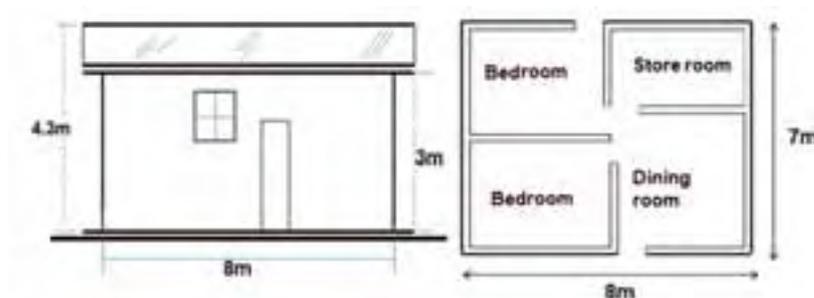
A housing unit with corrugated iron sheet roof and its floor plan.
